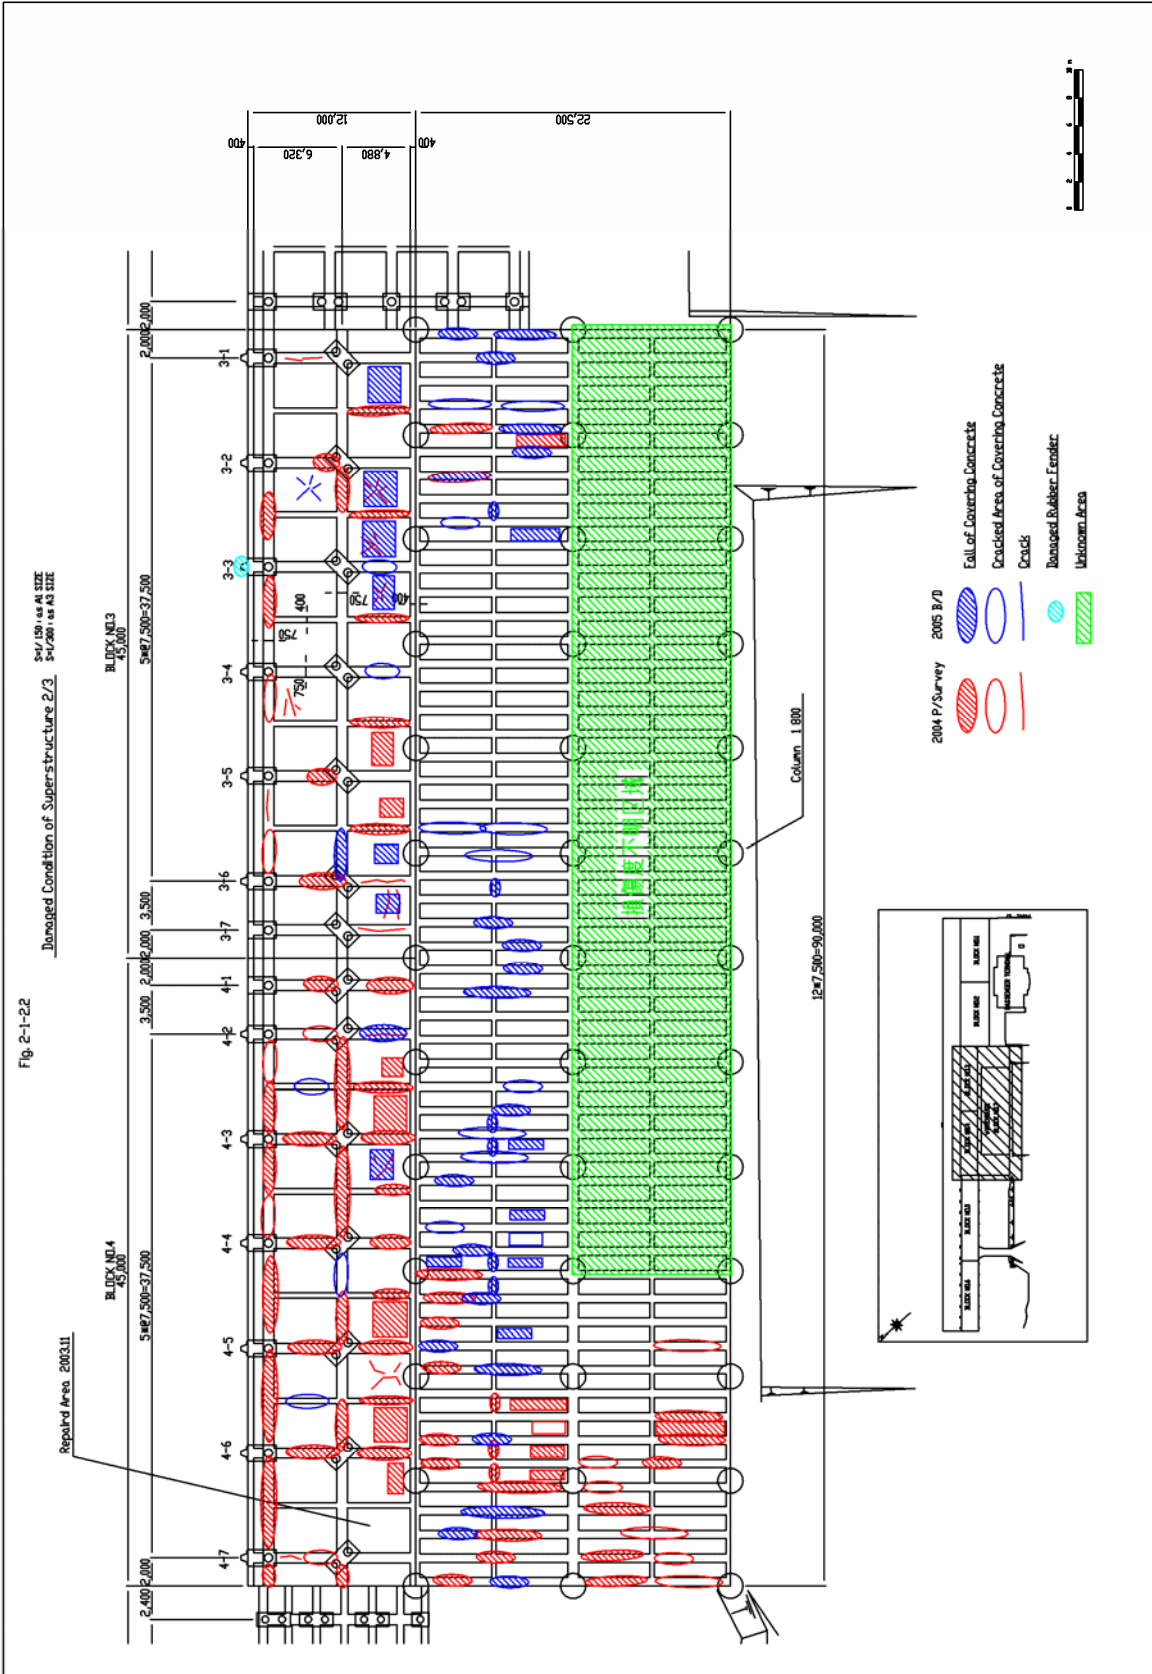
Damaged Condition of Superstructure (2)
